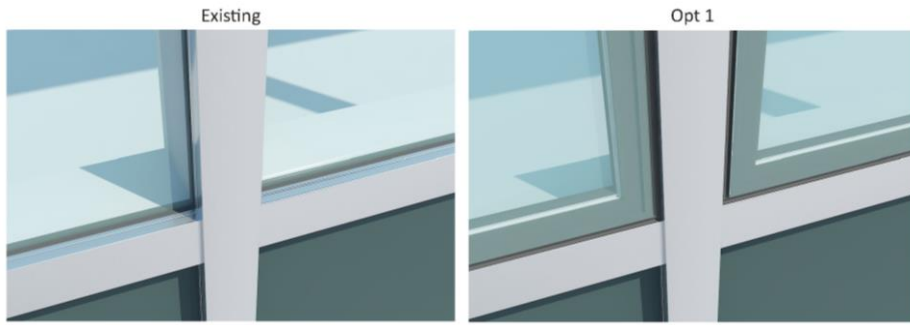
Close-up 3d images of a typical curtainwall joint at Lever House showing the existing and the proposed option 1 scenario with glazing shields on the vision panels only (Image by the author).
